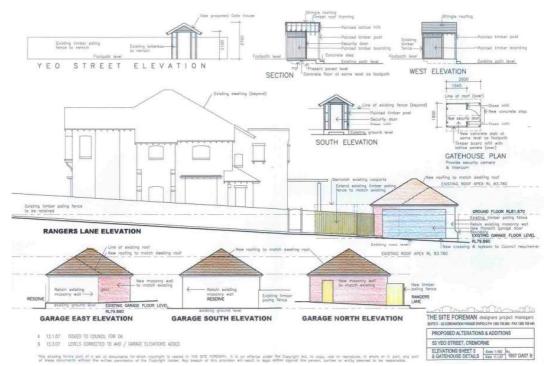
Proposed Yeo Street and Rangers Lane elevations, prepared by 'The Site Foreman' in January 2007, and amended in March 2007, as submitted with DA 56/07 (Source: North Sydney Council Archives, DA 56/07)
